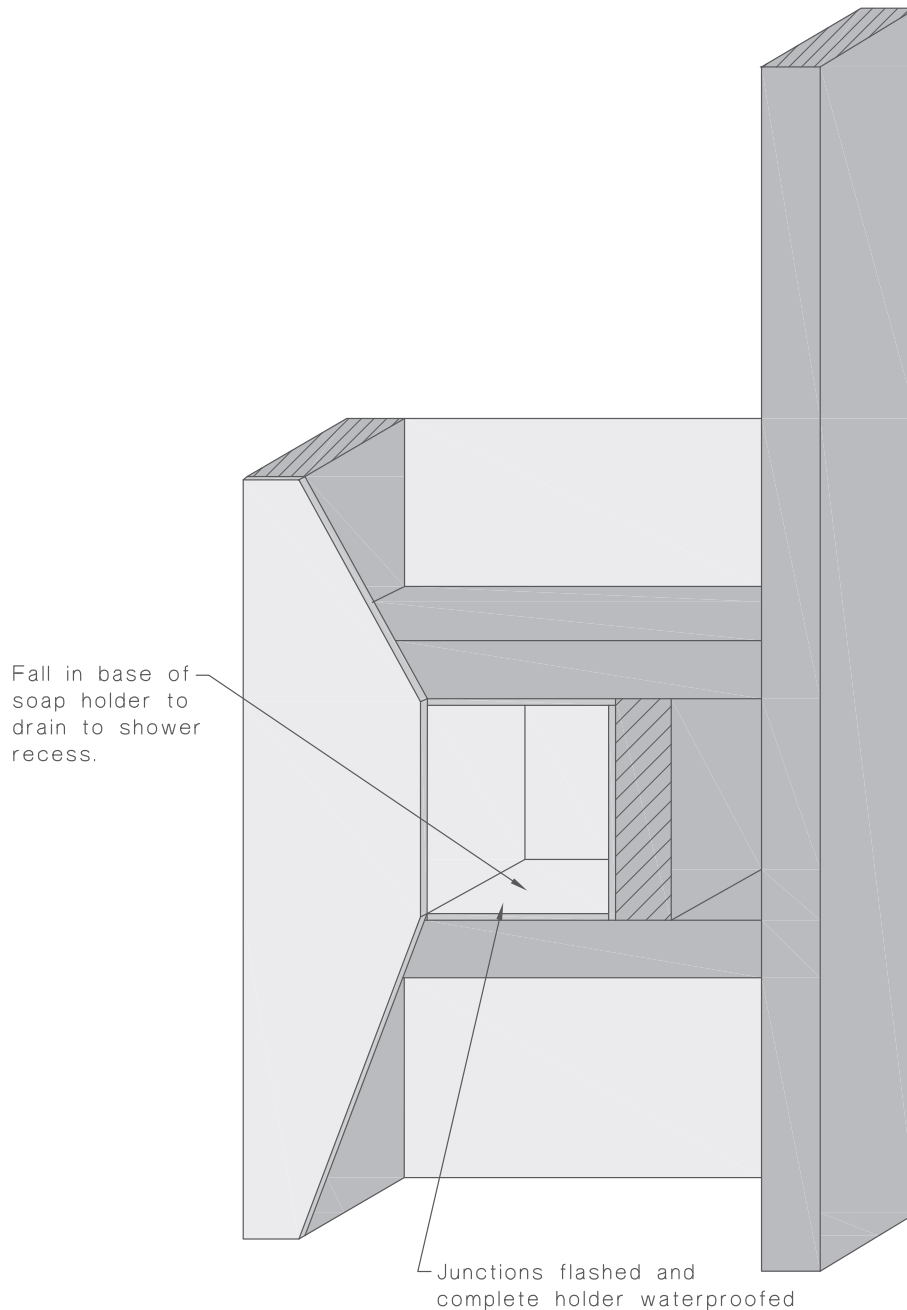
TYPICAL DETAIL FOR RECESSED SOAP HOLDERS
